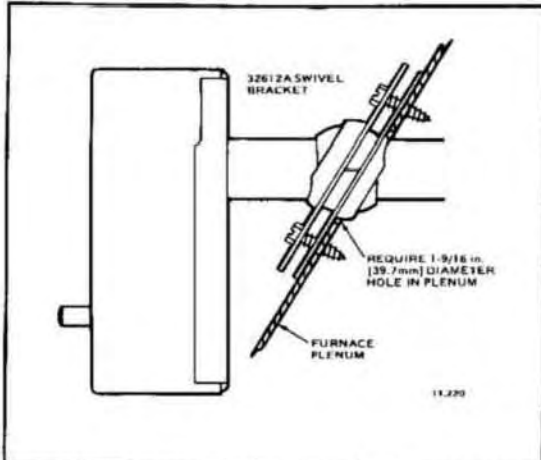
SWIVEL MOUNTING. REQUIRES A 1-9/16 in. [39.7 mm] DIAMETER HOLE FOR ELEMENT INSERTION.
